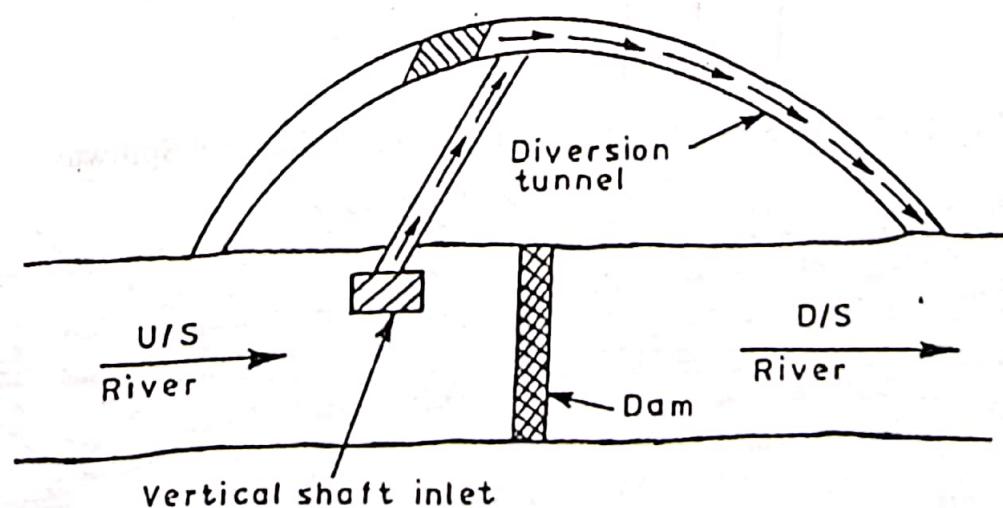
Diversion Tunnel being used as a conduit for the shaft spillway.
